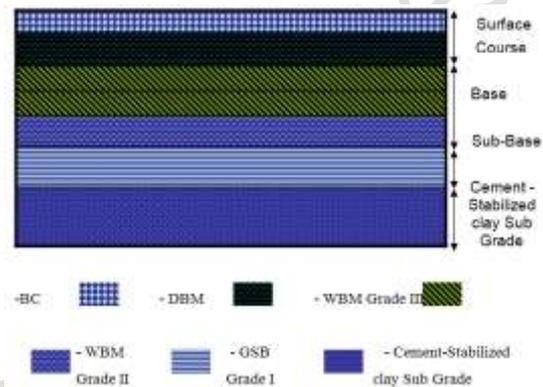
Composition of flexible pavement on Cement-Stabilized clay sub grade
